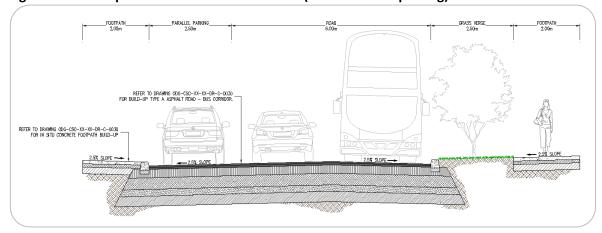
Proposed Boulevard cross-section (with on-street parking)
